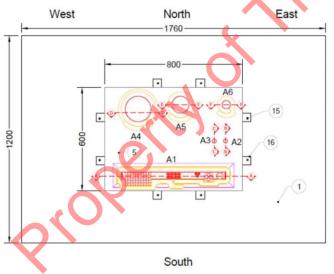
Plan view of tested specimens in FRT200118 R1.0
